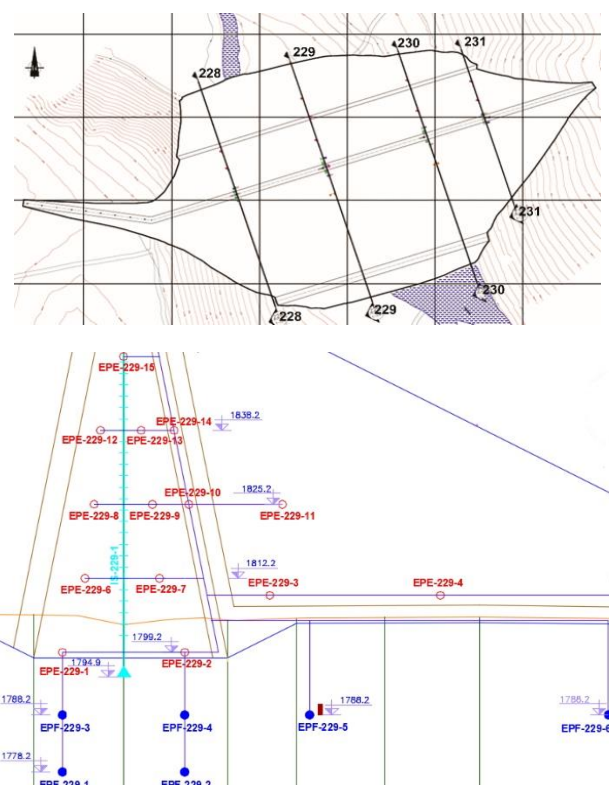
The Position of the tooling sections on plan and cross section of the core of the dam Eyvashan 229.
